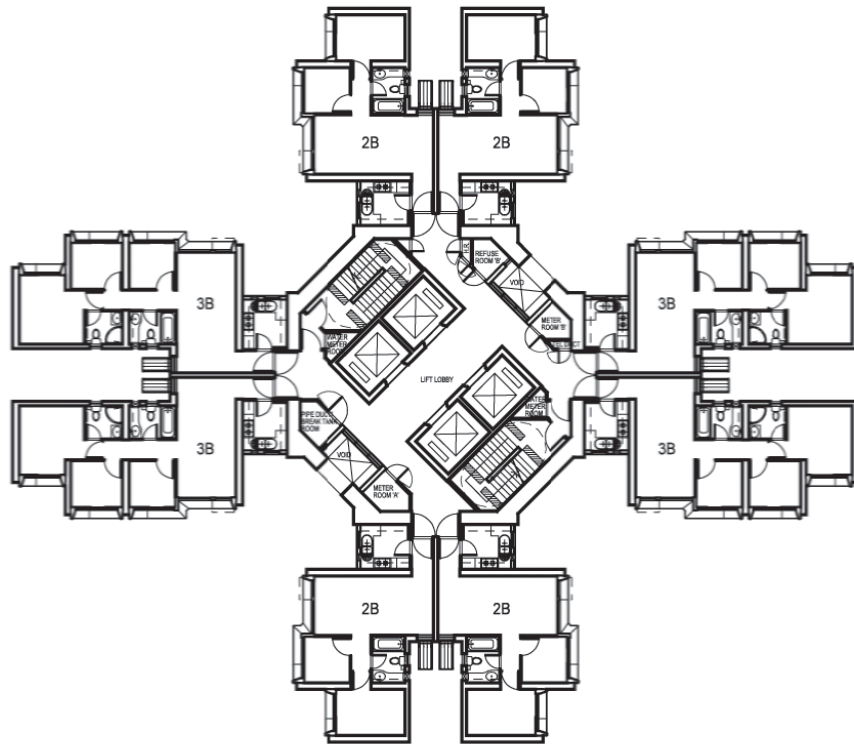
Standard Concord Block Public Housing Floor Plan
